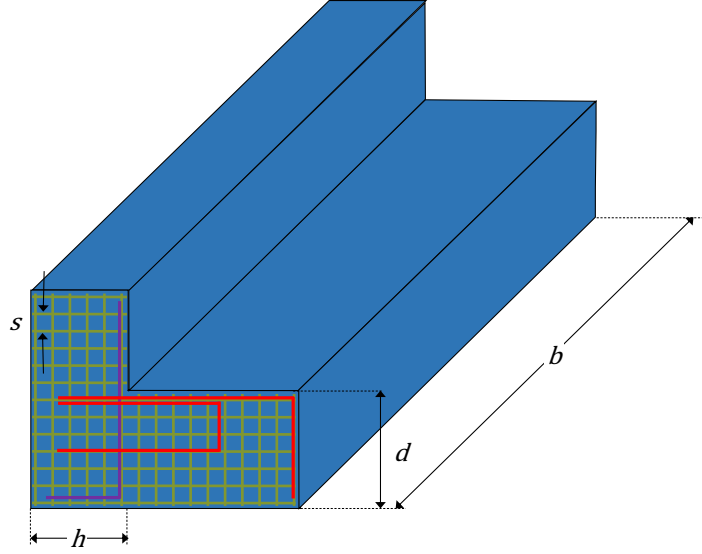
Typical in-span hinge seat reinforcement detailing
